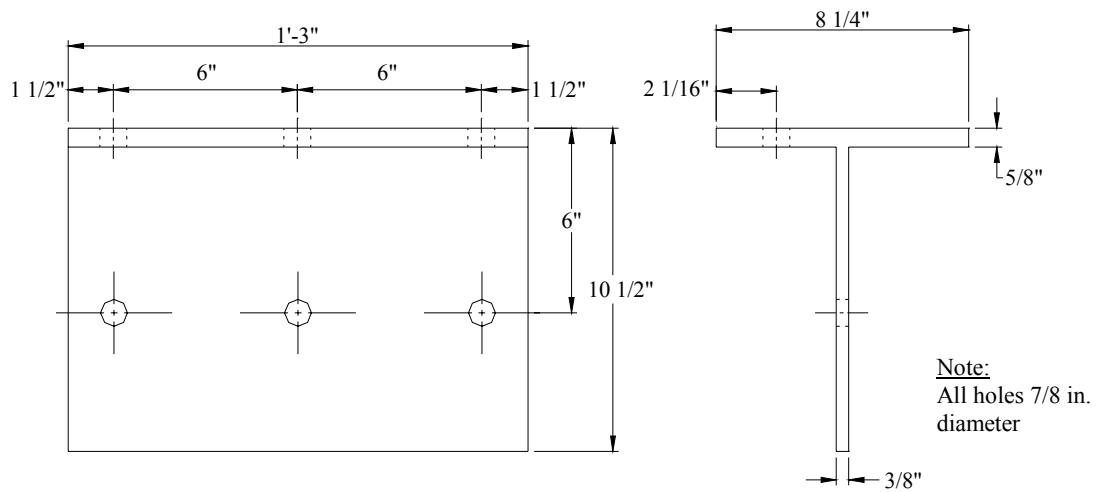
Diaphragm connection used in the construction of MBISB 2.
